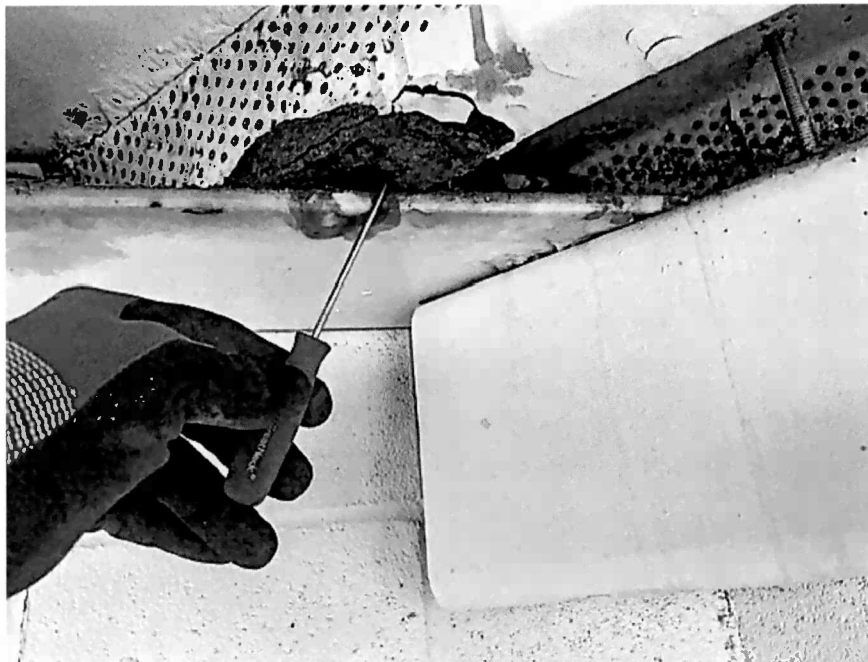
Severely damaged roof deck bearing at north-west wall
